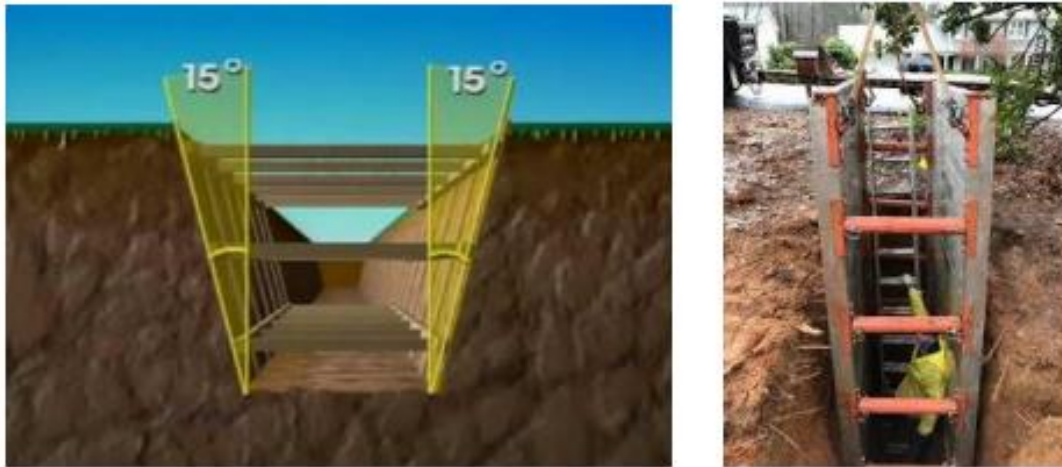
Securing Trench Walls: Sloping Excavation and Shoring
